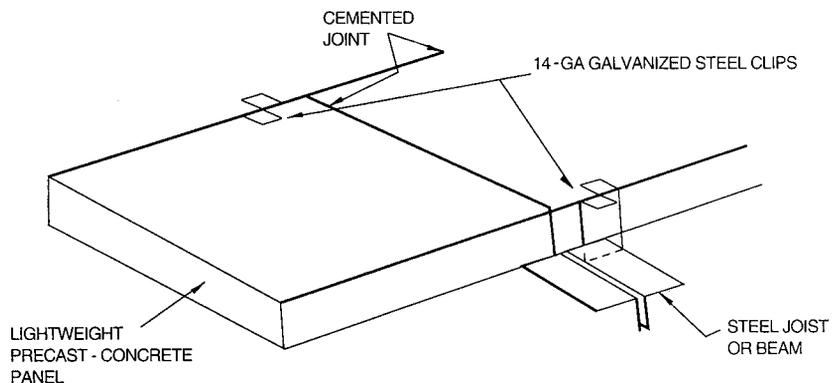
Typical clips for attachment of lightweight precast-concrete panels to steel framing. The clips are driven into place for a wedge fit at diagonal corners of the panels. Minimum flange width for supporting member is preferably 4 in.
